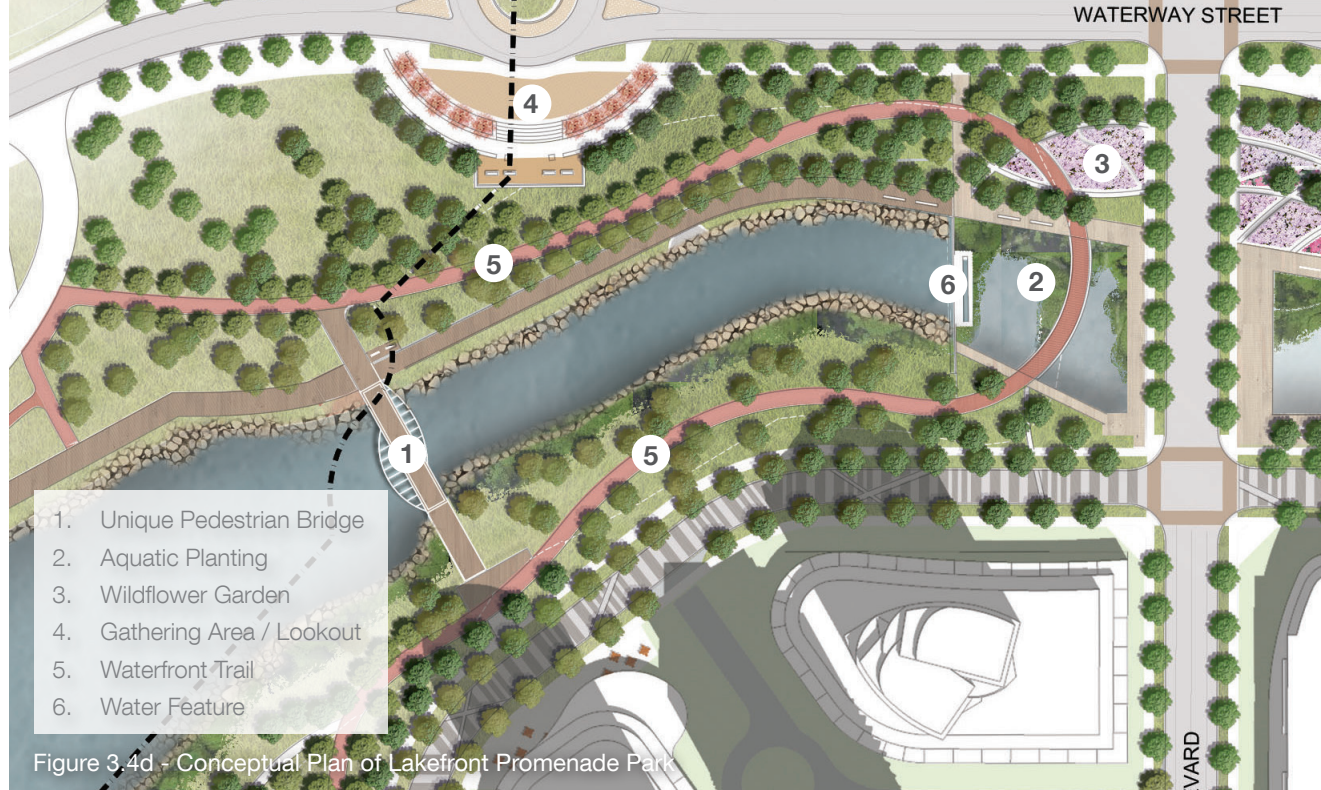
Conceptual Plan of Lakefront Promenade Park
